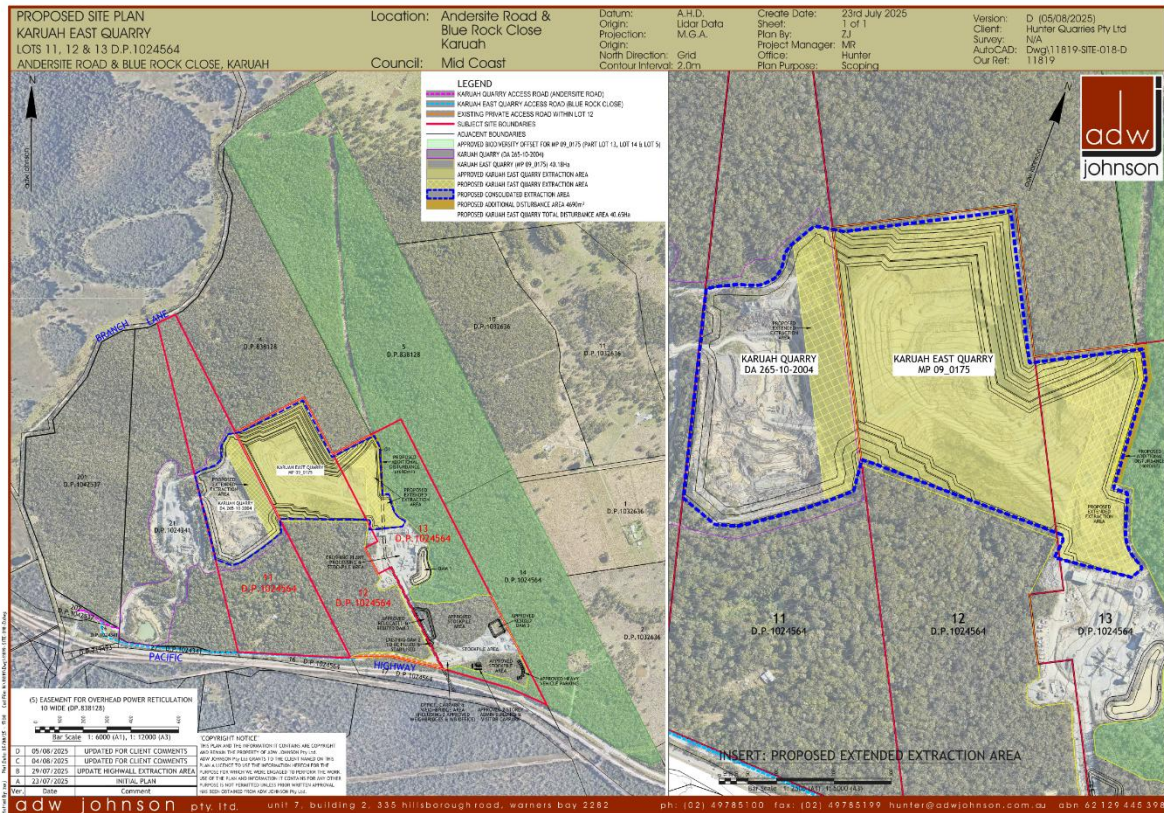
Proposed Site Plan with Project Area in orange. (Source: ADW Johnson)
